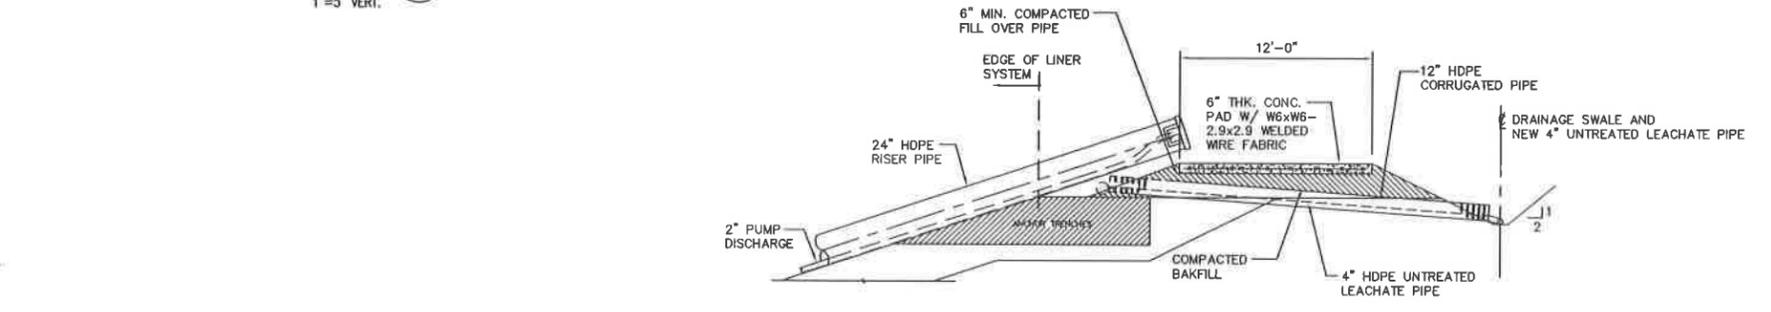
DETAILED PLAN RISER CONNECTION AND ROAD CROSSING
